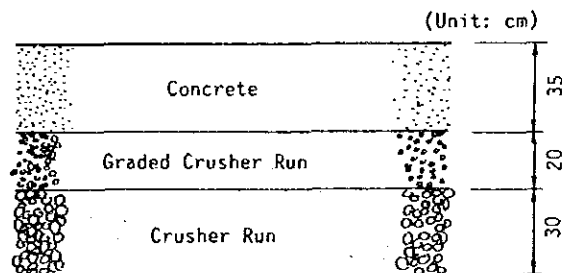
Standard Cross Section of Transfer Crane Track
